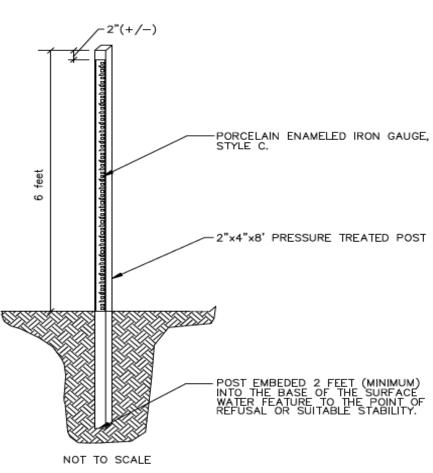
Typical Staff Gauge Installation Cross-Section
